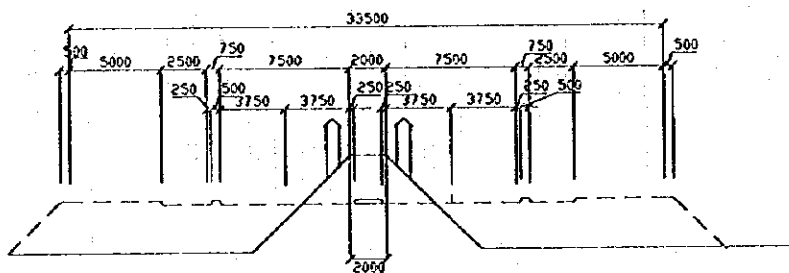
Improvement Scheme of Ring Road 1
